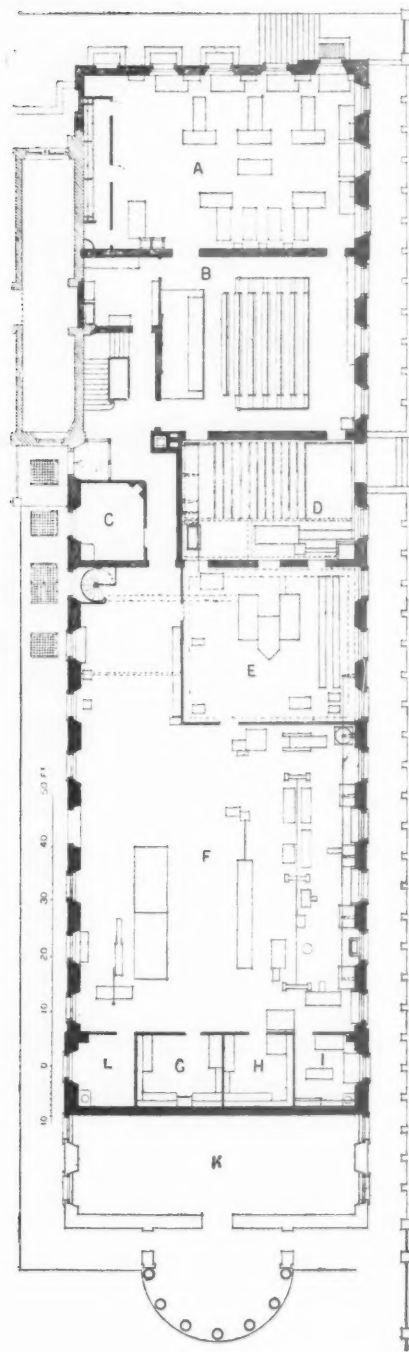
GROUND FLOOR OF ENGINEERING AND ELECTRICAL DEPARTMENT.
